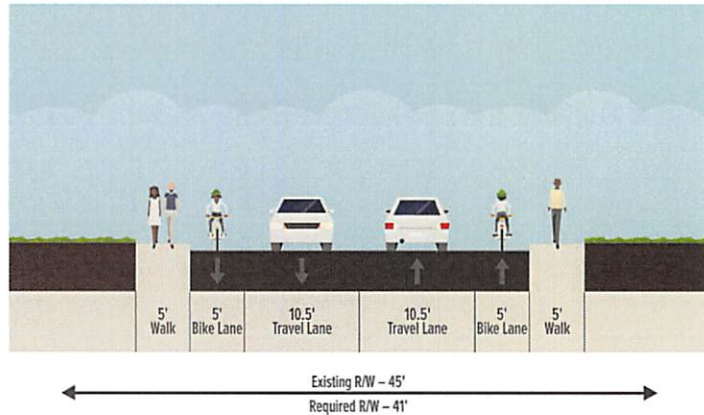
HOVEY STREET TO COLLEGE STREET
